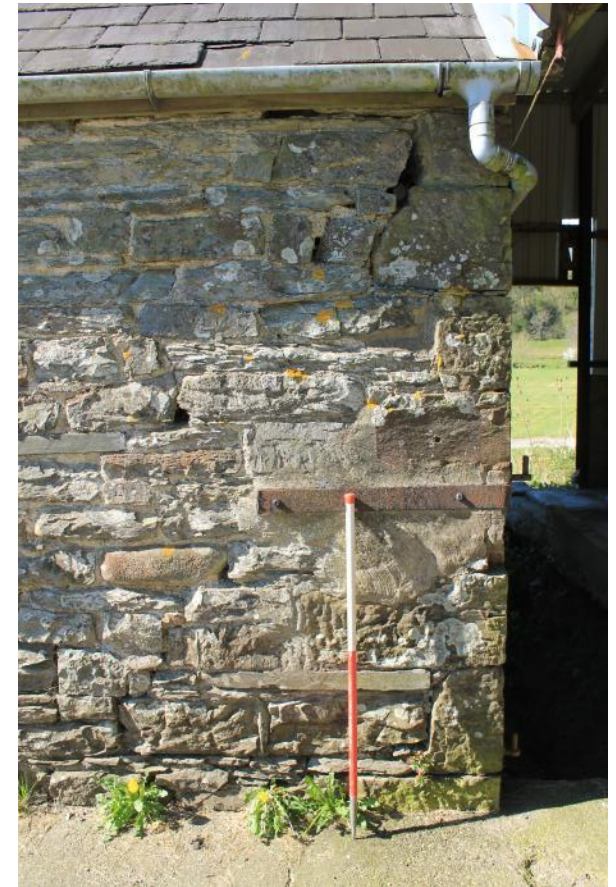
Iron gate hinge bracket, northeast facing elevation.
